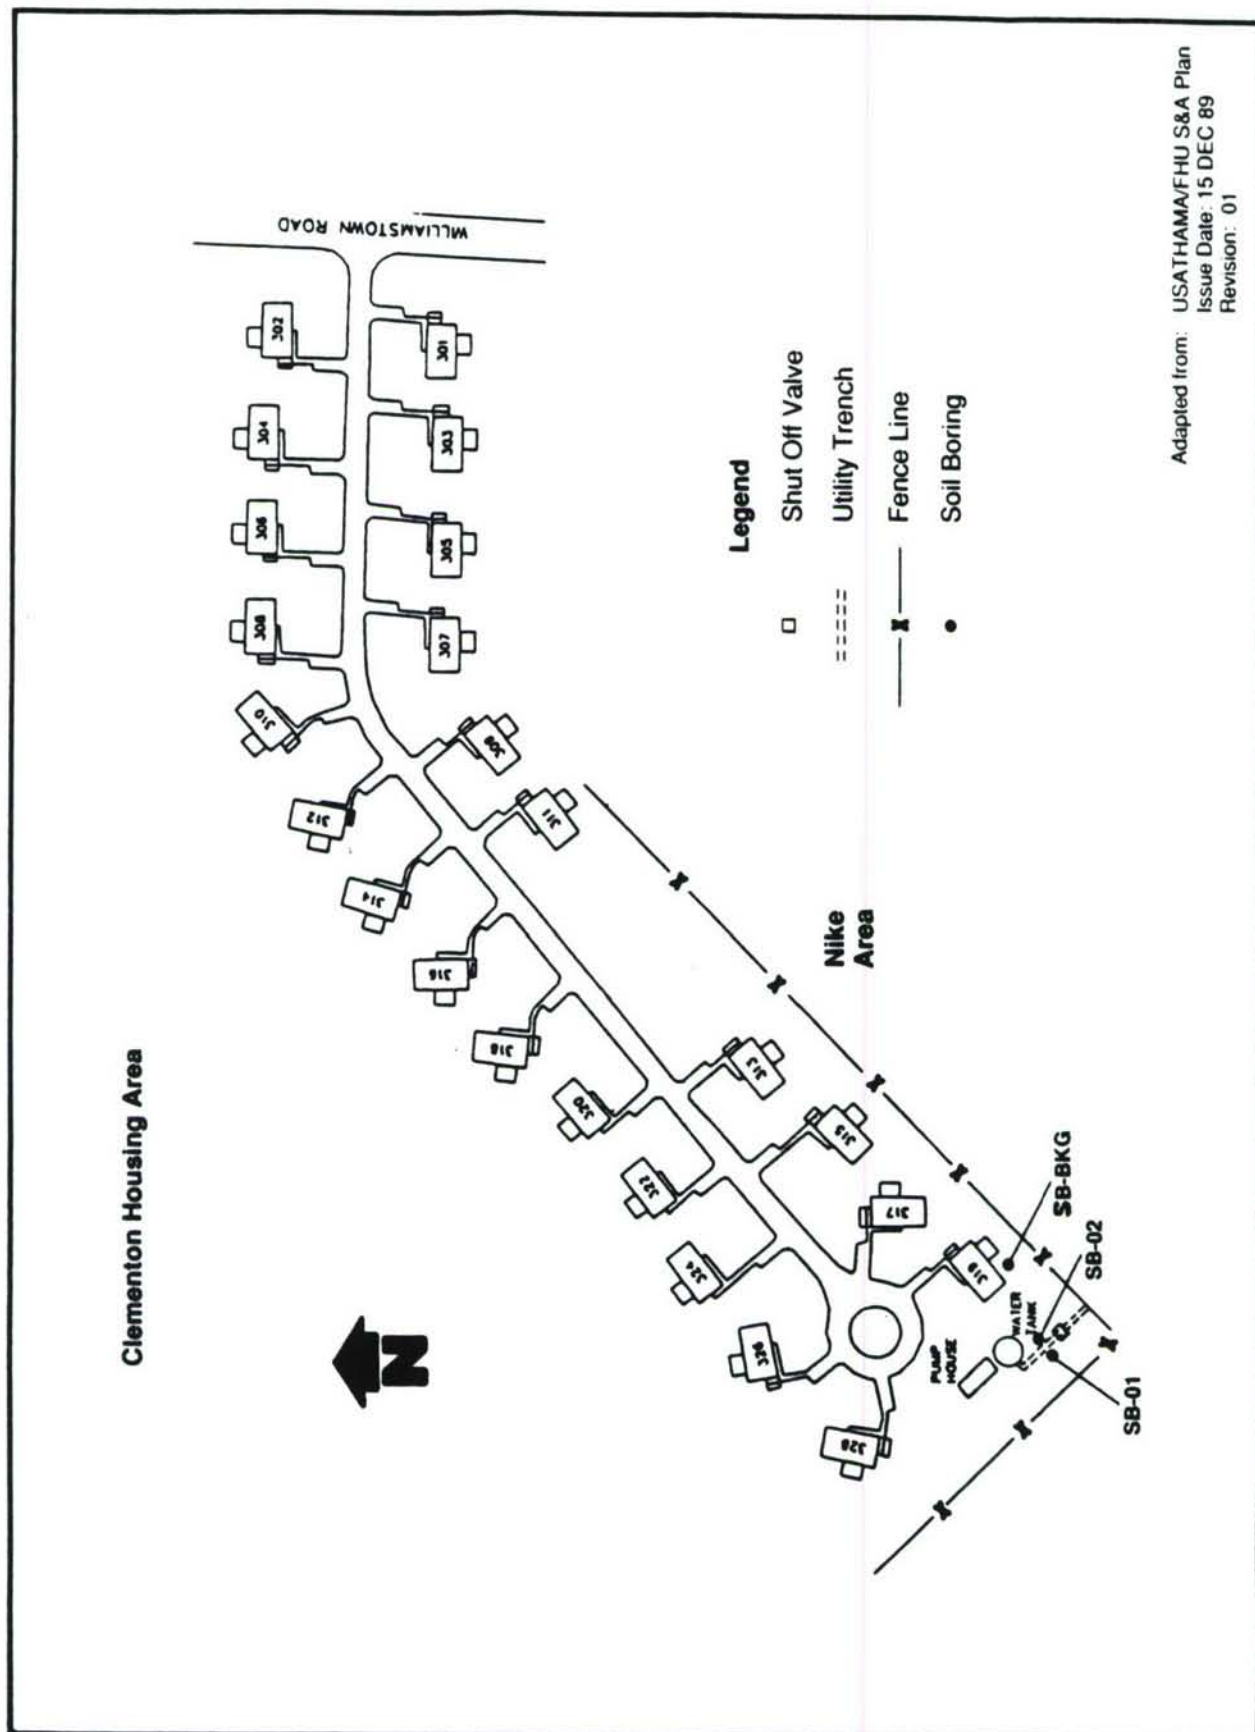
SITE PLAN OF FAMILY HOUSING, CLEMENTON, NJ
